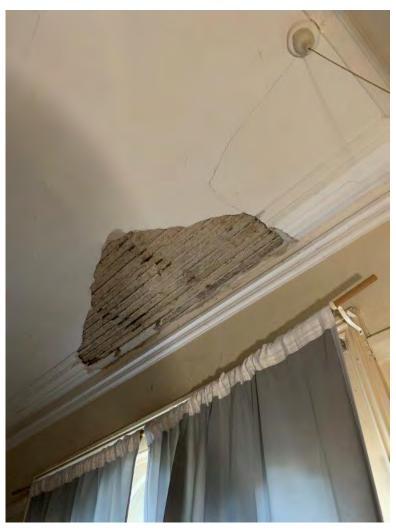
Cracks in Ceiling and Brick Wall
